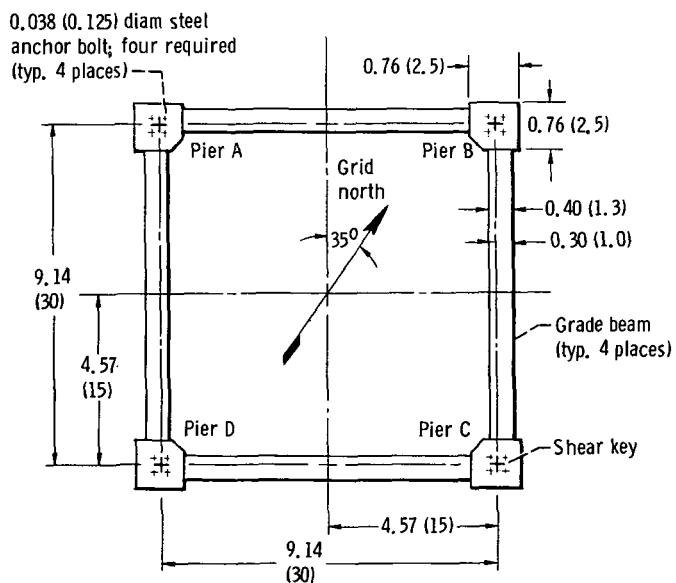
Foundation plan for 100-kilowatt wind turbine tower.
